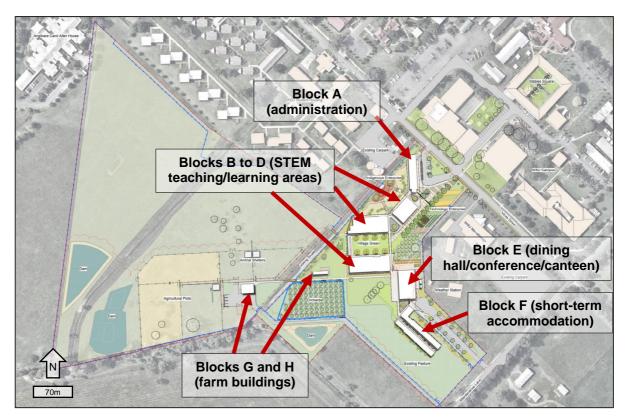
| Site Plan (Source: Applicant's RtS 2021)
